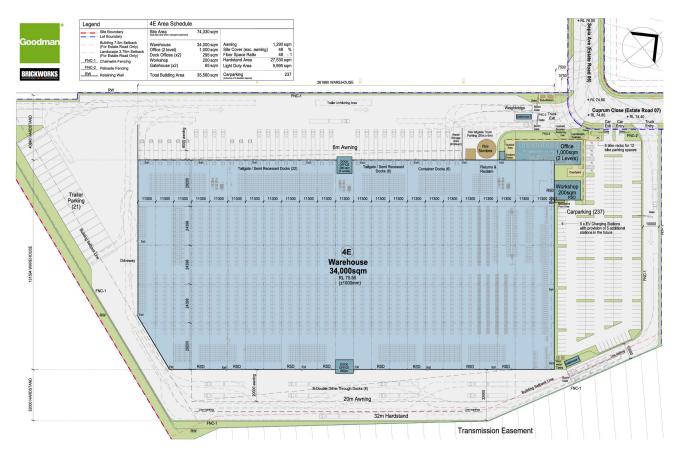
Oakdale West Estate, 4E site and Warehouse Plan
